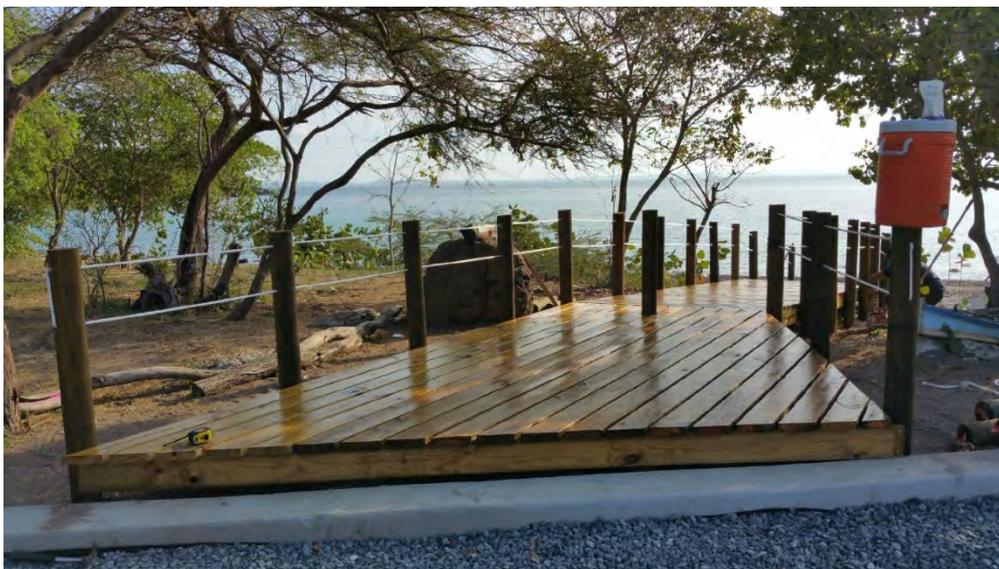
Public access boardwalk located at Punta Soldado prior to hurricanes Irma and Maria.
